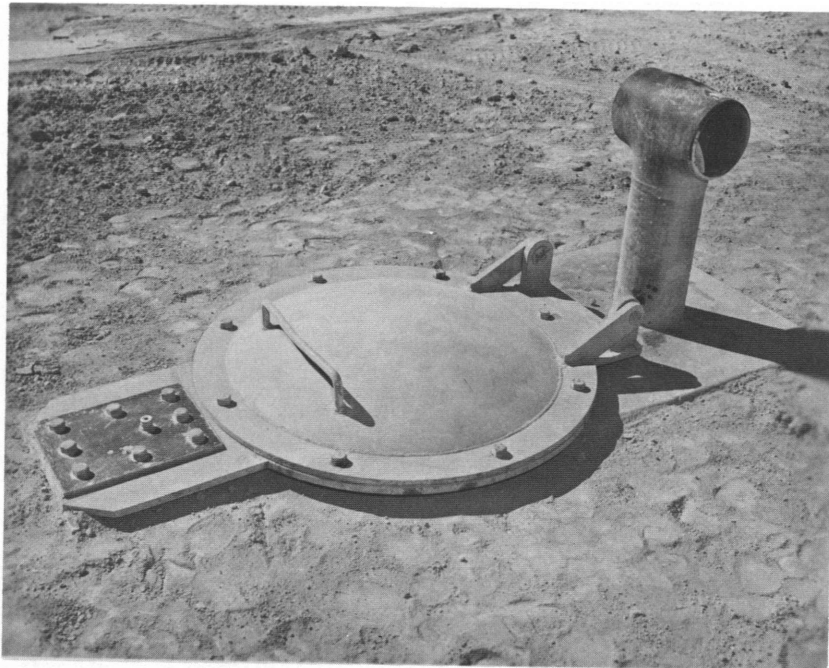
Blast closure valve test plenum air-intake and access hatch after backfilling.
